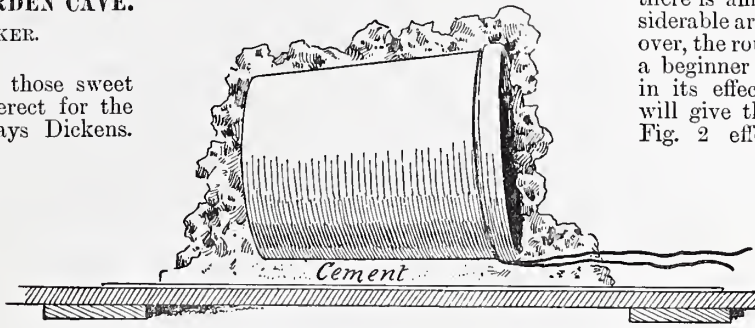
Section, showing Method of Making the Pot Pocket.
